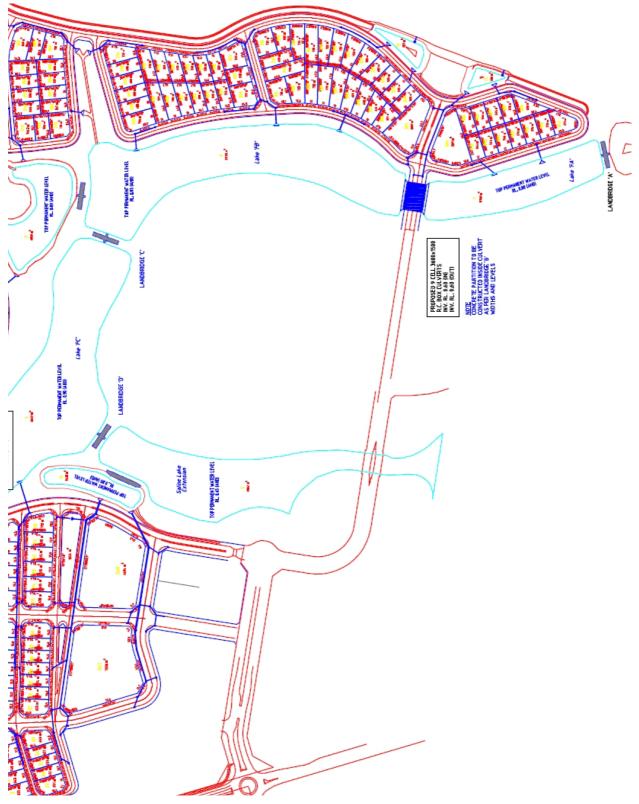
(b) Concept Layout and Crossing Details for Preliminary Concept Development
